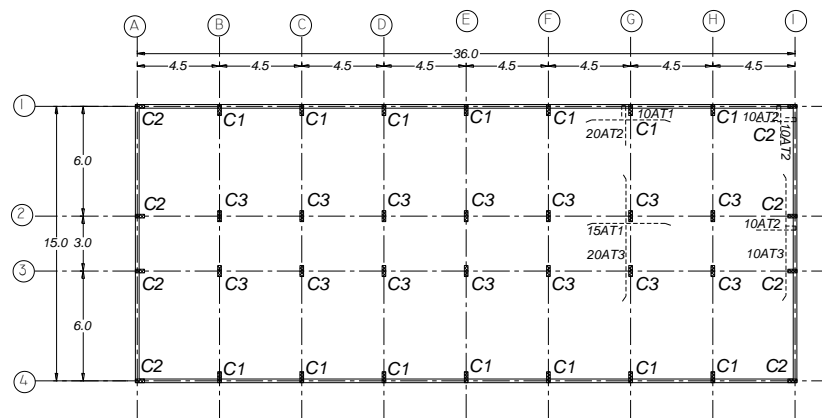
Typical reinforcement details for the floor slabs of the school
